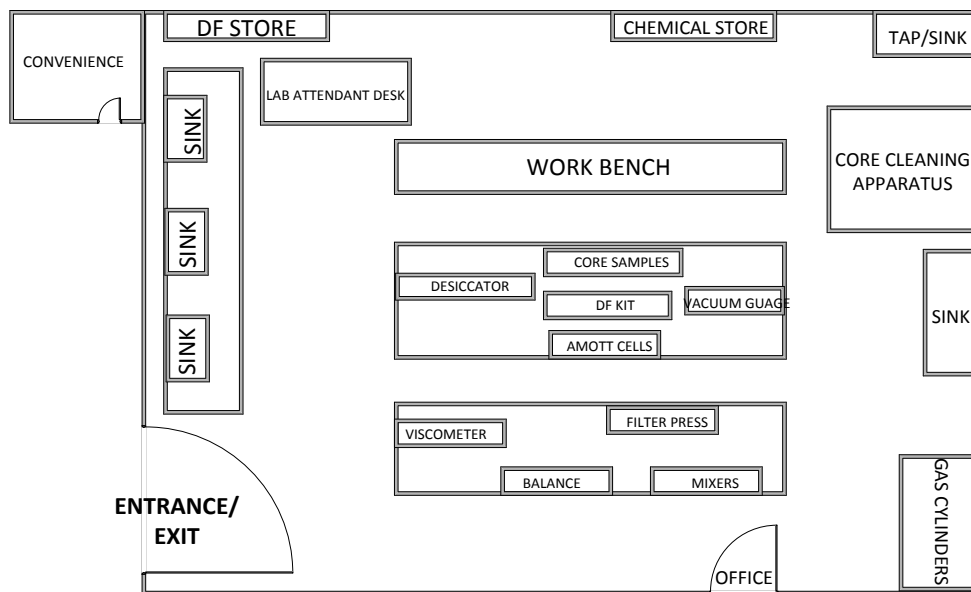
Floor plan of reservoir laboratory of the department of chemical/petroleum engineering, UNIUYO (Drawn by author)
